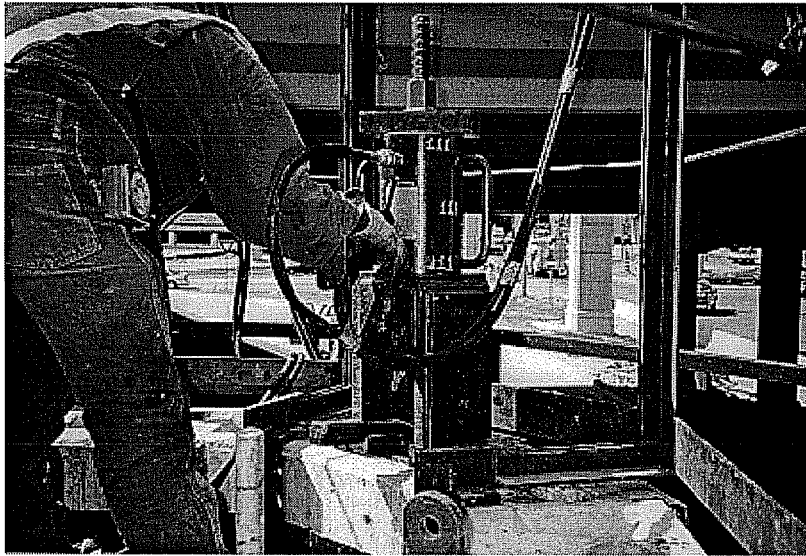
Steel support frame for segment prior to cast-in-place base construction.
